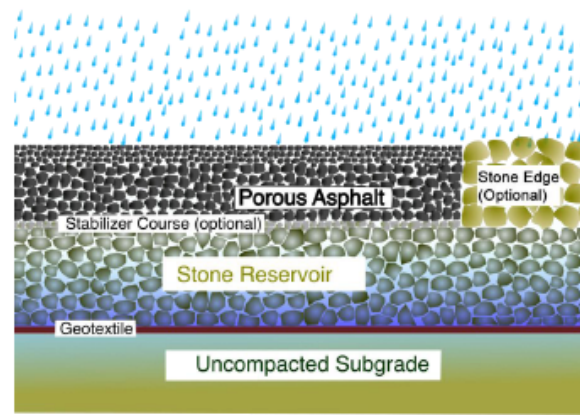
Typical porous asphalt pavement with stone reservoir cross section
